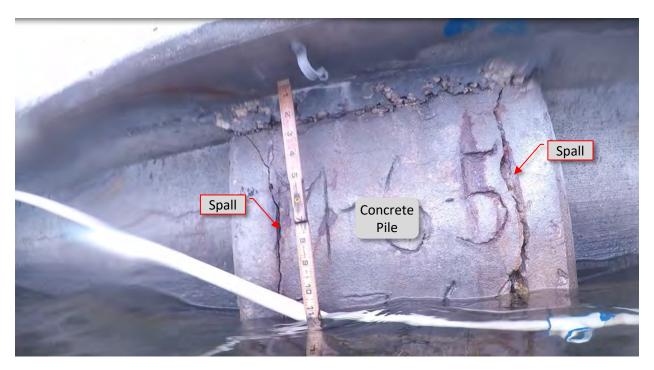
P23. STA 4+28. Break/spall at both flanges at pile. Honeycomb area.
